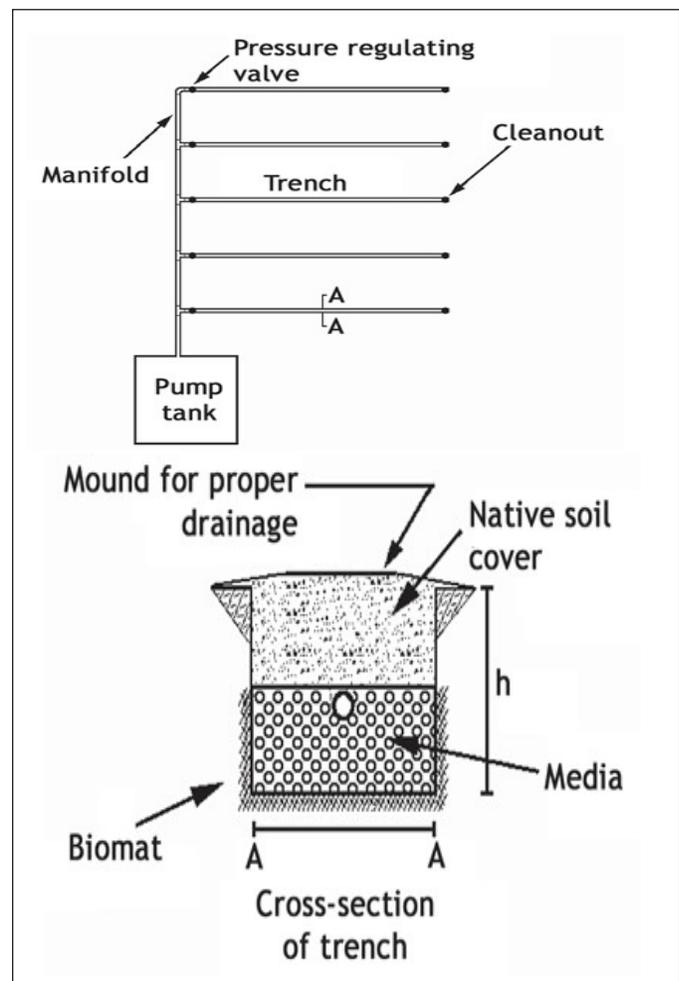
Plan view of low-pressure distribution (top) and trench detail (bottom)
